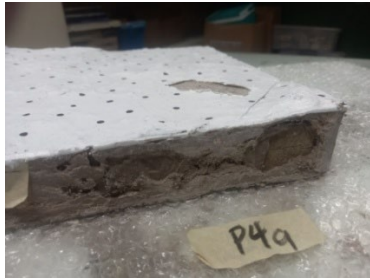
P4a wallet specimen showing the diagonal cracks after the test
